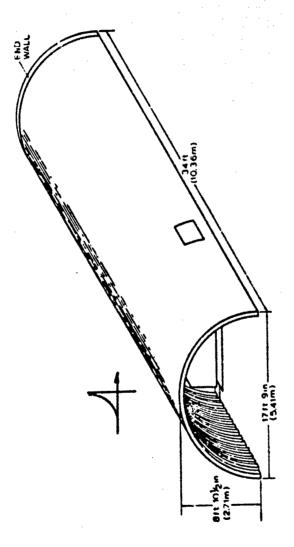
First Generation (TAB VEE) Shelter Arch - Shelter "B", Scaled
